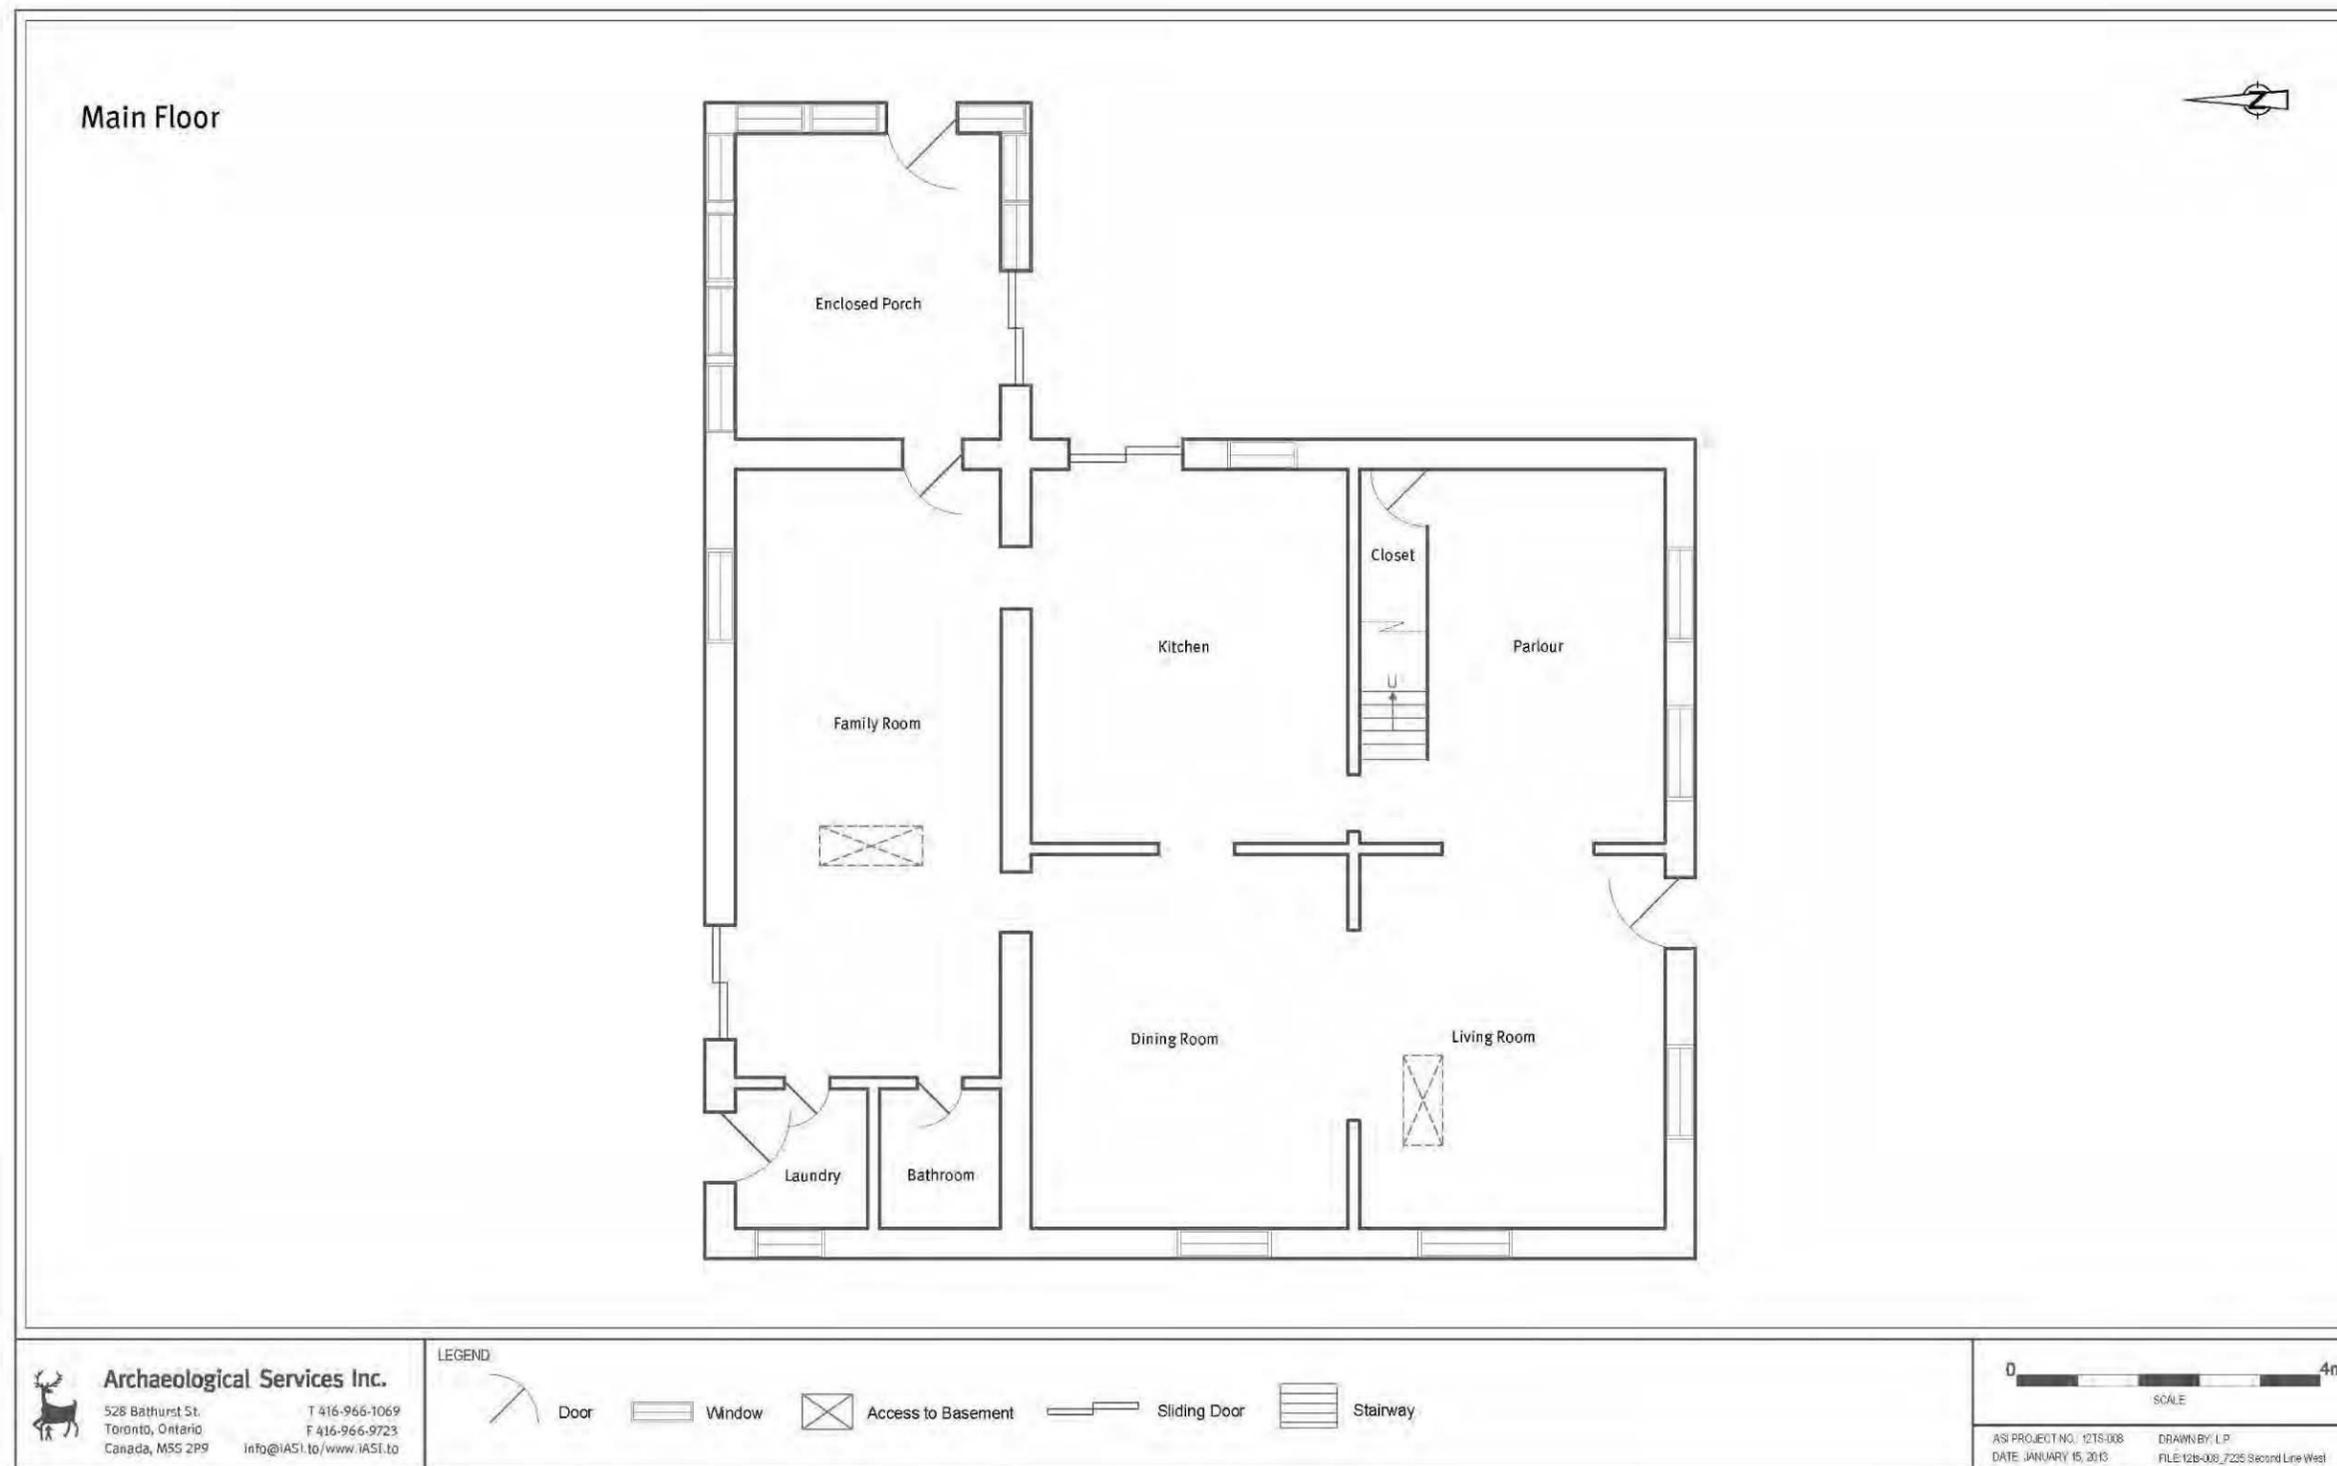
Schematic floor plan of the main floor at 7235 Second Line West.
